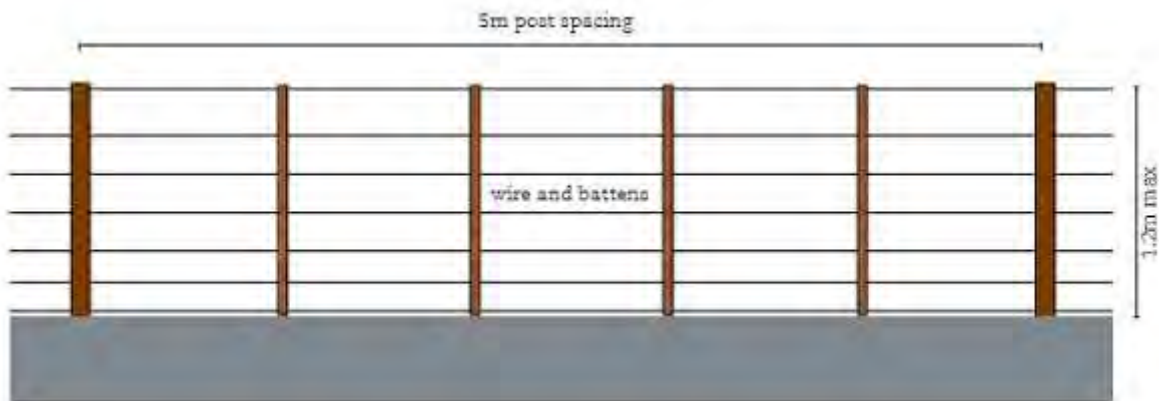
Fencing Detail 2 - AC Reserve and Buffer Zone Boundaries
